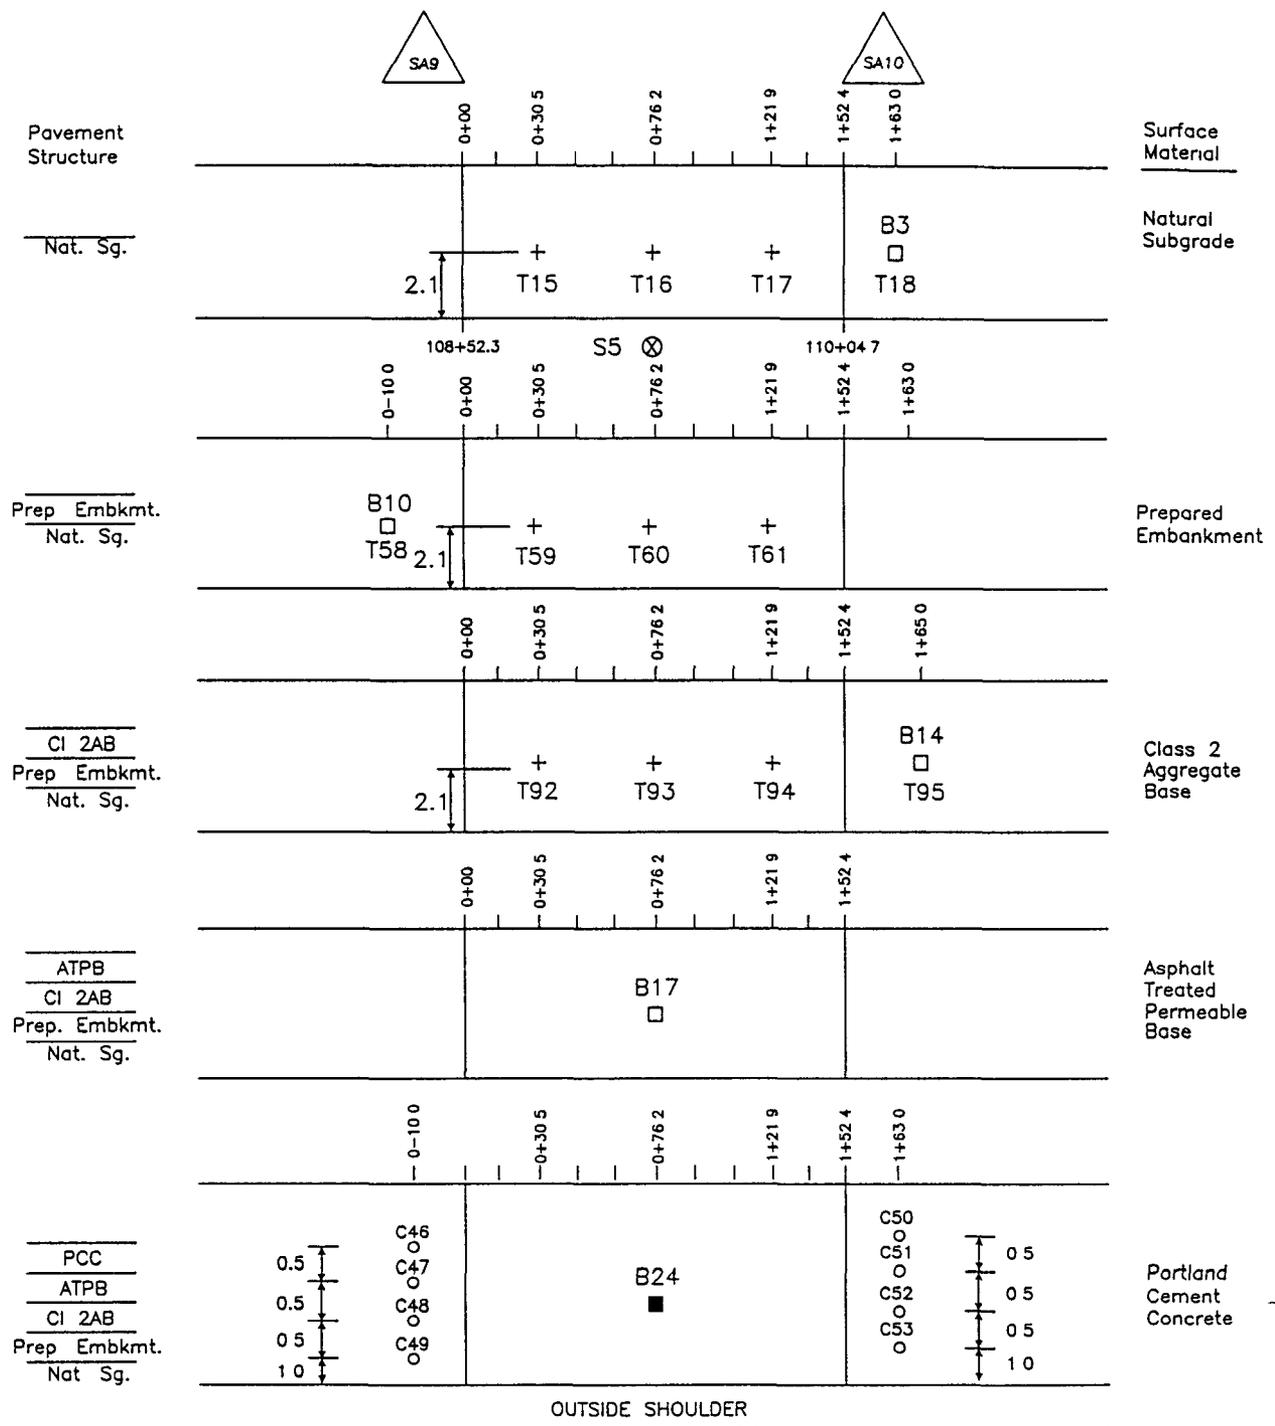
Sampling and test plan for test section 060207, SPS-2 California
